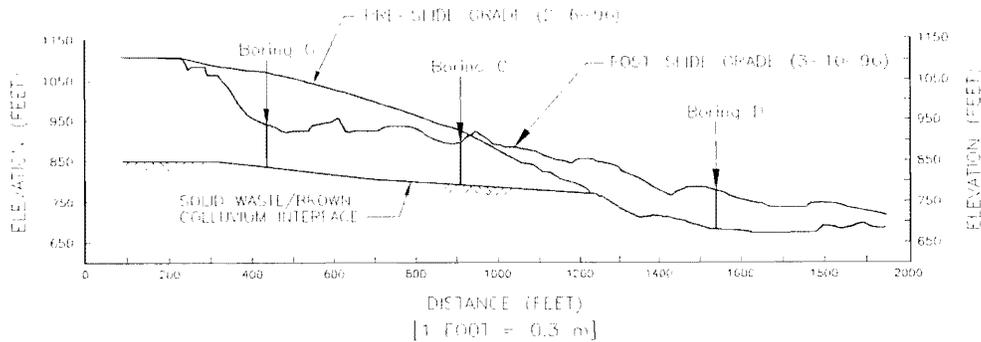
Slope cross-section showing slide mass geometry and boring locations
